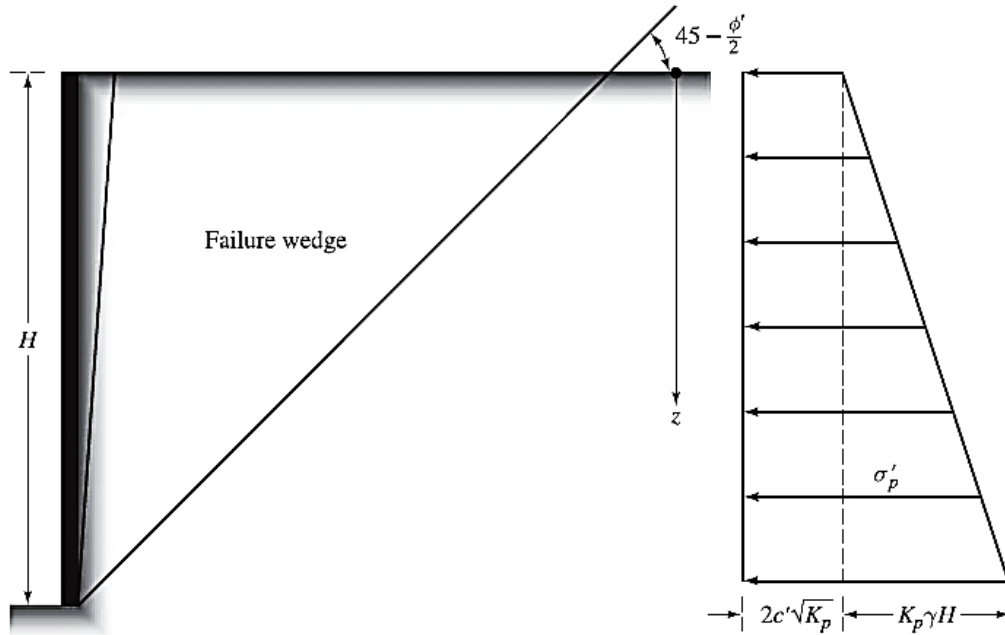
Rankine's passive earth pressure distribution against a retaining wall cohesive backfill. (After Braja M. Das "Fundamentals of Geotechnical Engineering")
